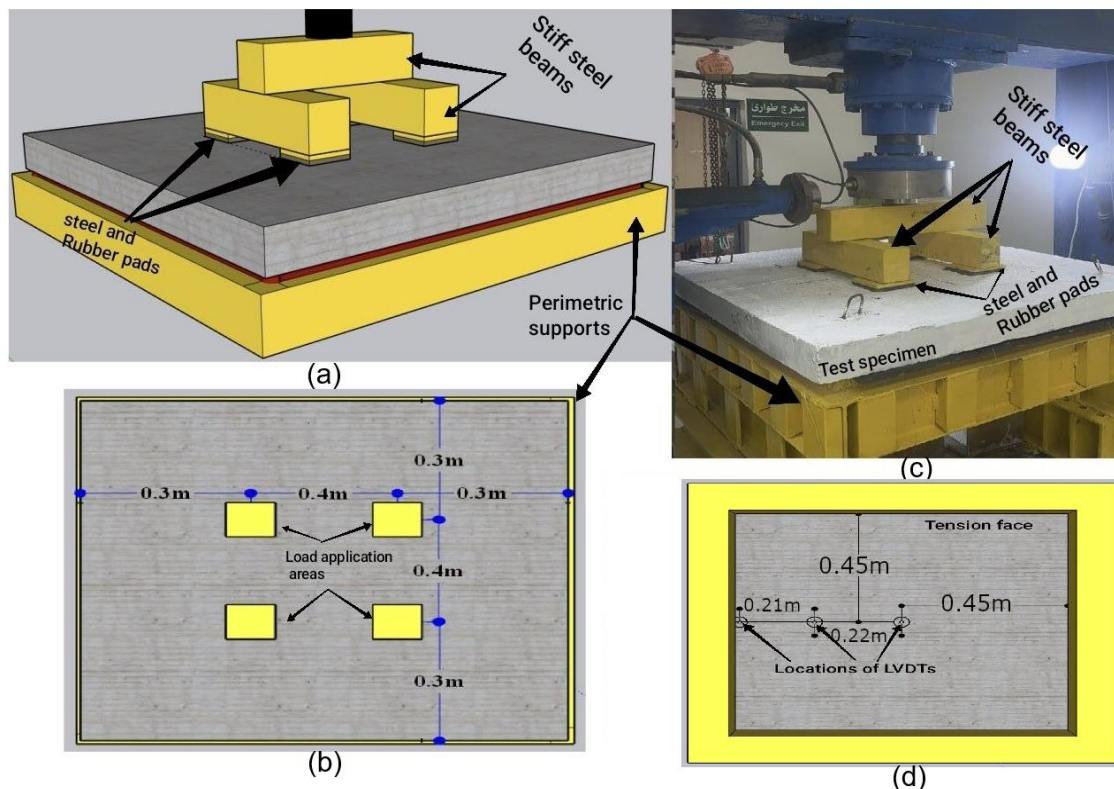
Experimental setup (a) 3D schematic view; (b) top view; (c) the specimen positioning and the applied loading scheme; (d) Layout of LVDTs installed for deflection measurements
